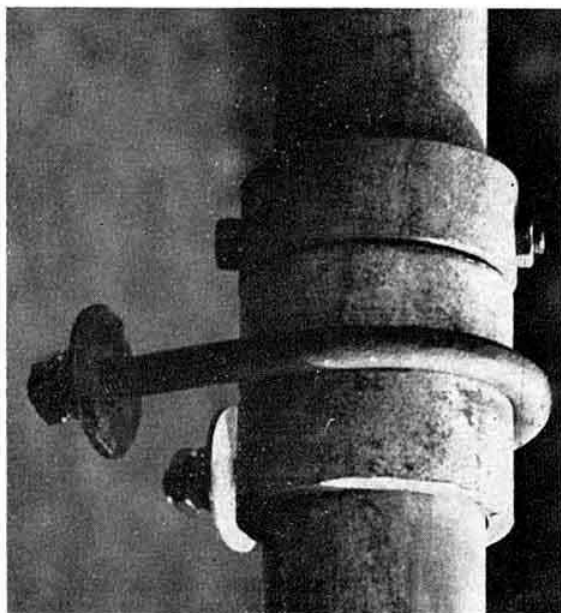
Close-up of the upper assembly clearly shows the bearing, the securing U bolt and the collar (bolted to the mast) which rests on the bearing and supports the weight during erection
